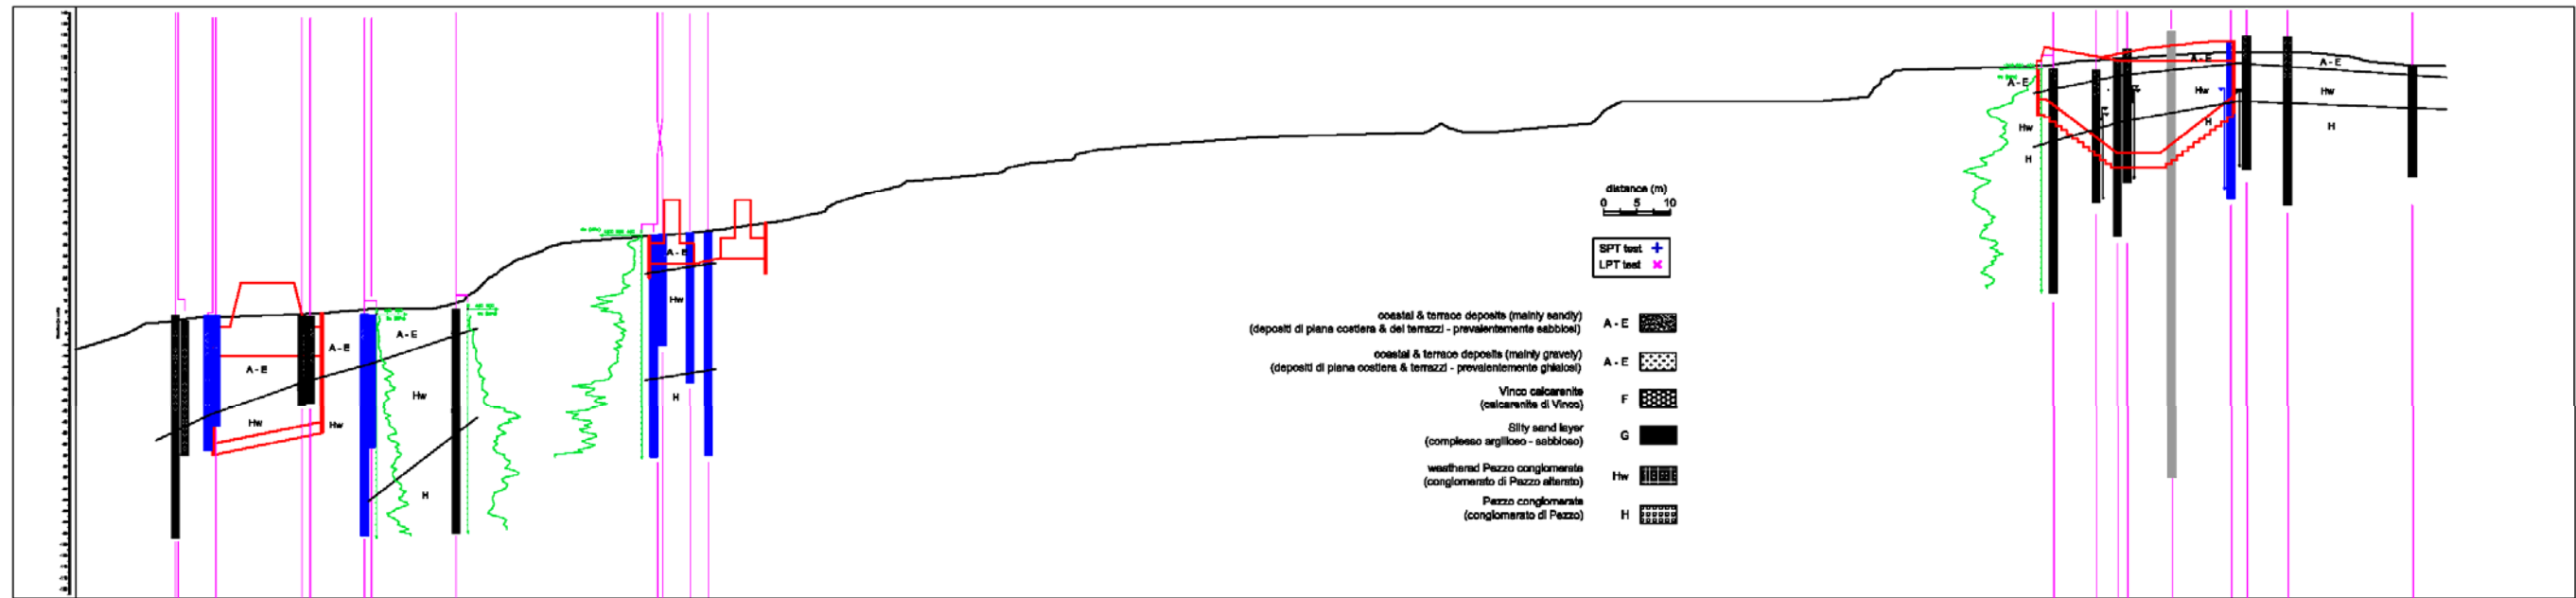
Calabria shore - geotechnical longitudinal section: global view
